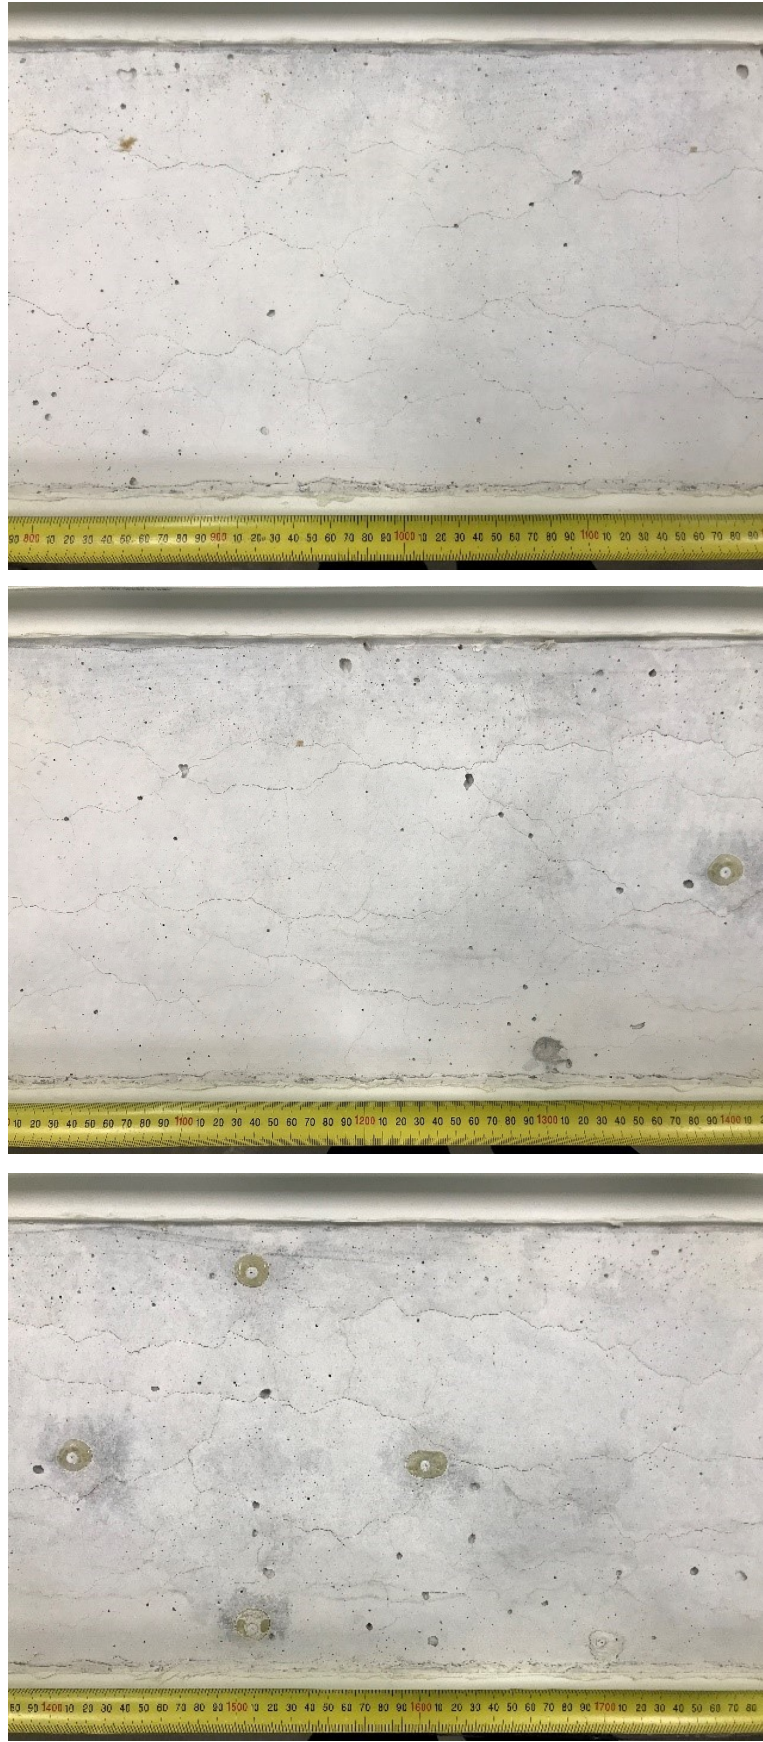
34 Longitudinal cracking on R2 beam surface (photos taken on 17/08/2020, 500 days)
